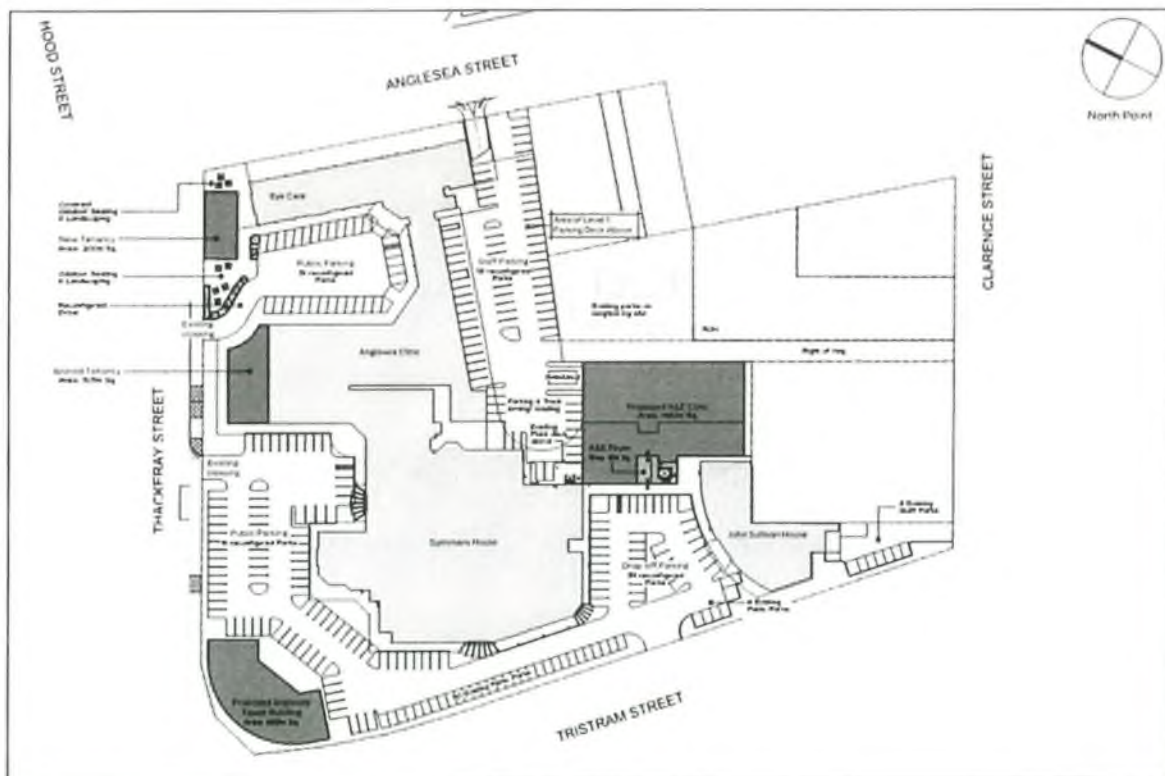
Proposed Development: Anglesea Medical Centre, Hamilton
